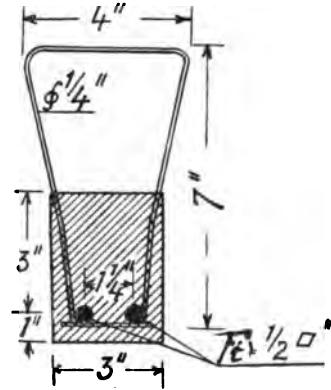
CROSS-SECTION OF CONTROL BEAM.
